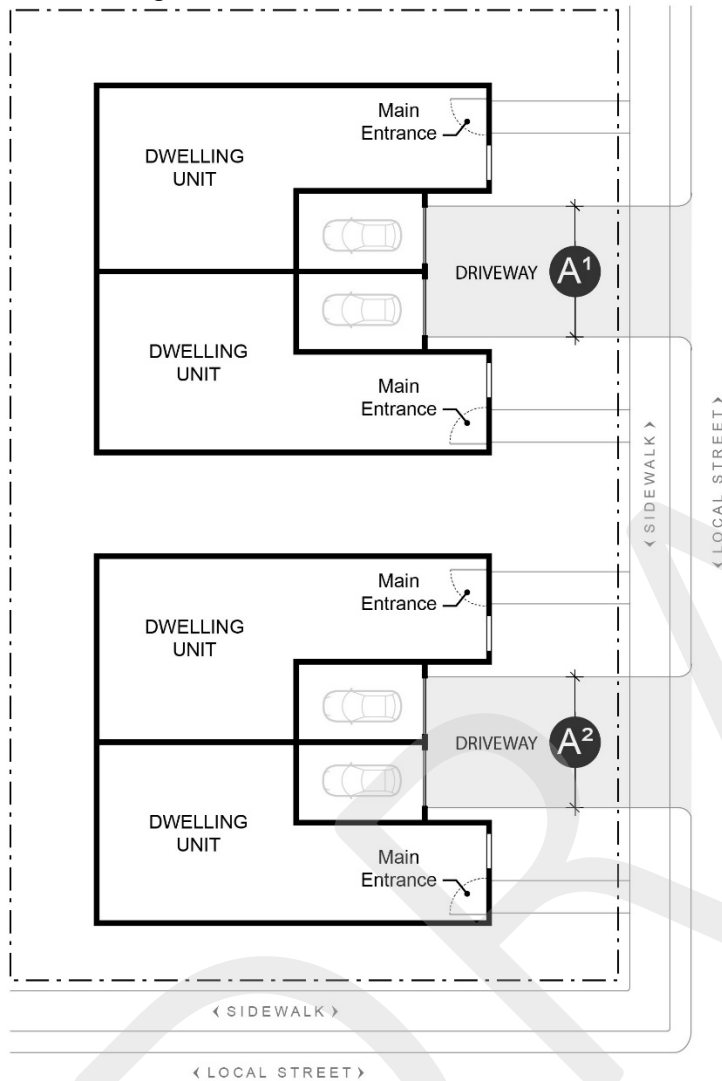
C.2.c. Driveway Approach Width on Local Street – Shared Driveway
